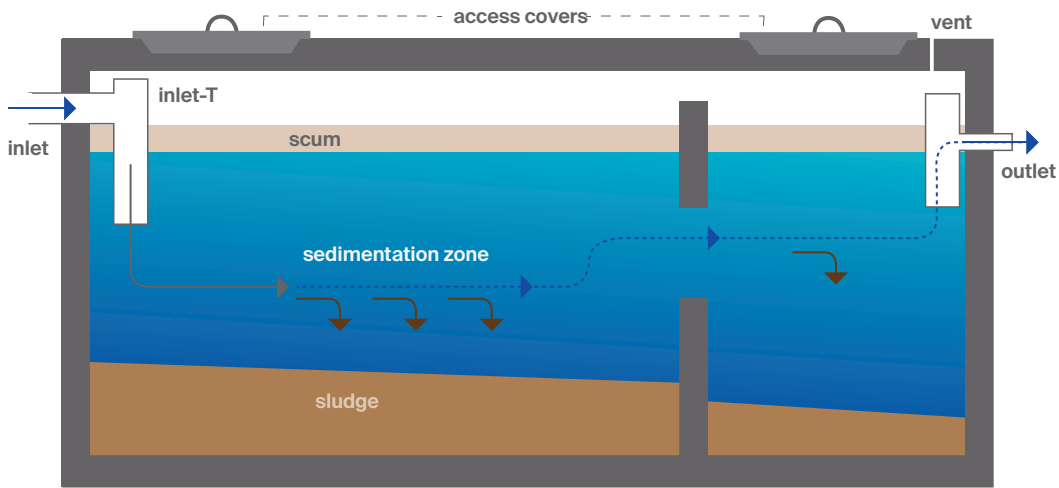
Section view of a septic tank (adapted from Tilley, et al., 2014)
